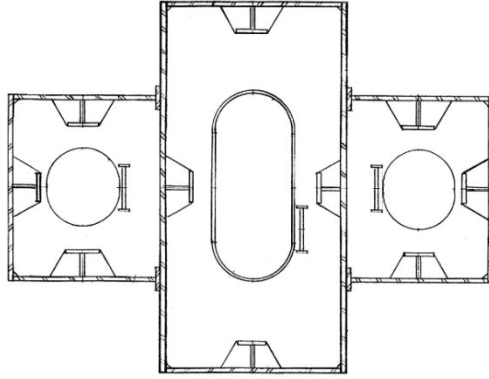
Main tower cruciform layout (adapted from B&T)
